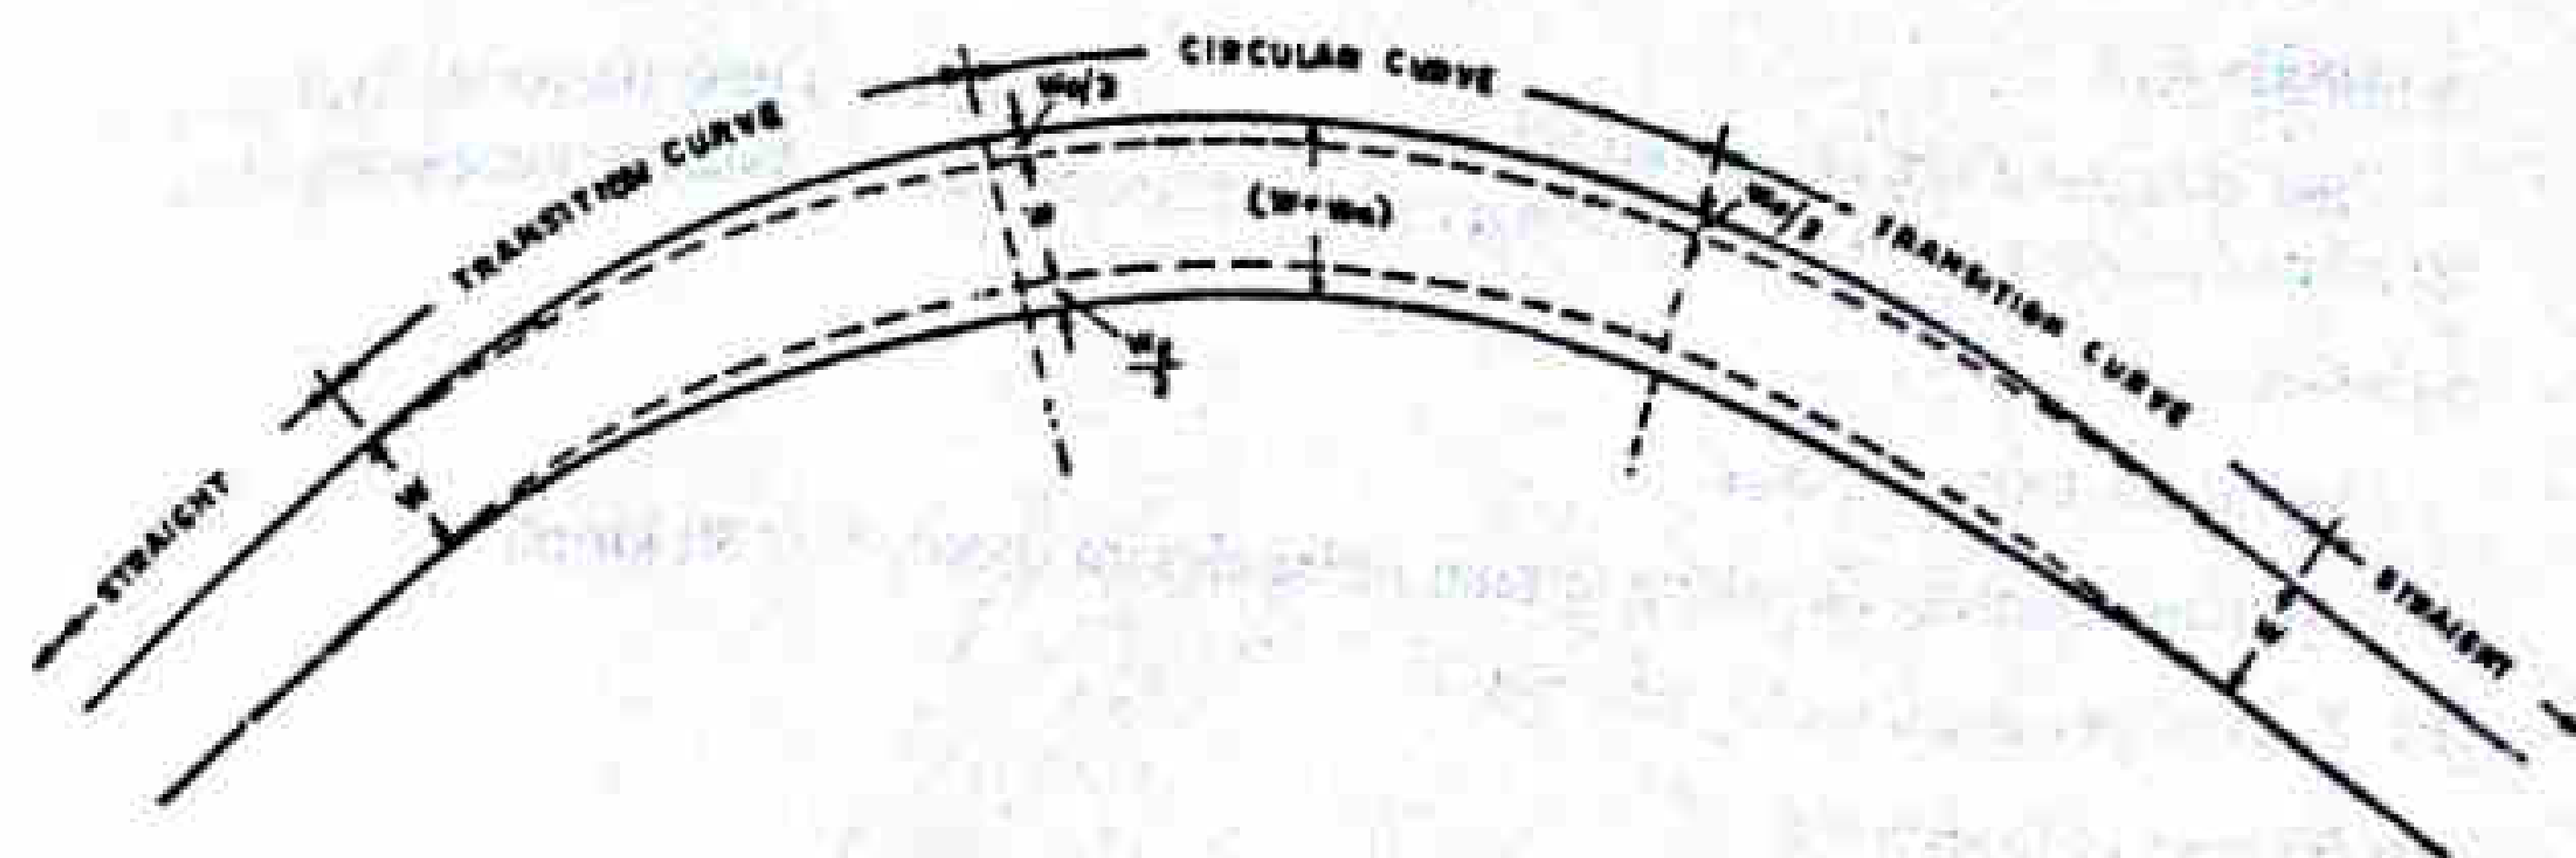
Extra Widening of Pavement on Horizontal Curve
